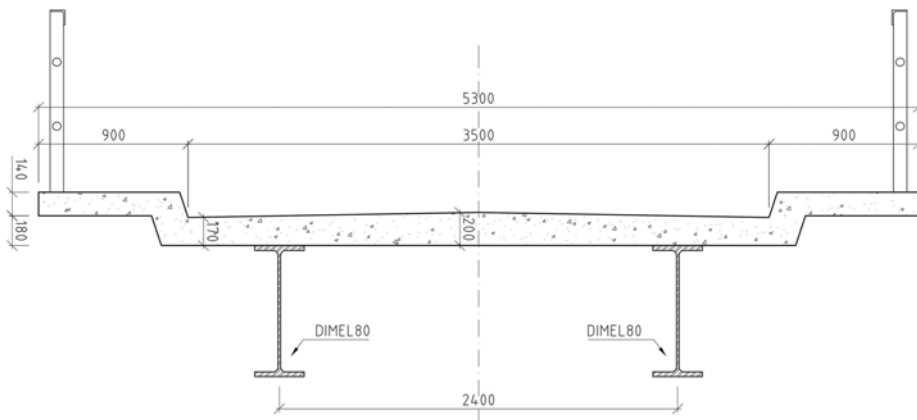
Cross-sectional dimensions used to model the Marlo Bridge in Abaqus.
